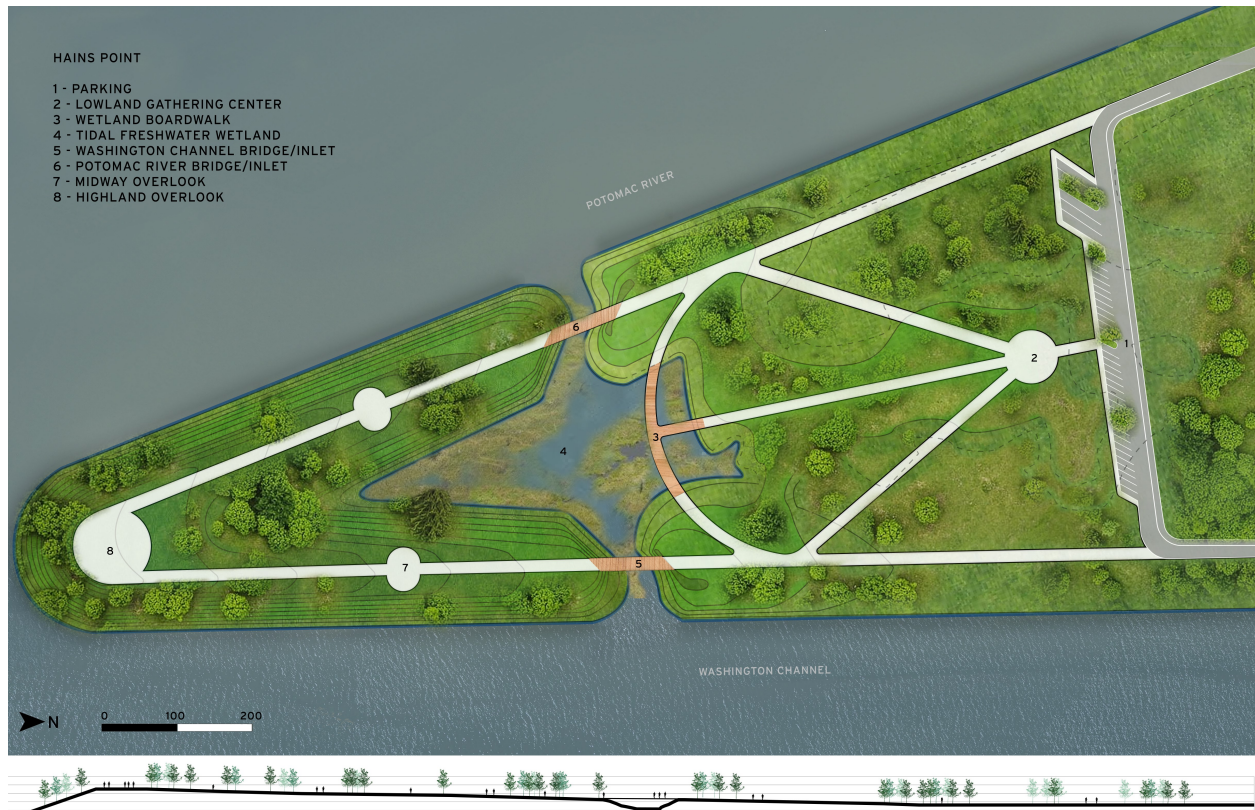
Proposed site plan of Hains Point. A wetland splits a lowland and highland area. Below the site plan is a section stretching the length of hillside, from the hillside top to the parking lot.
